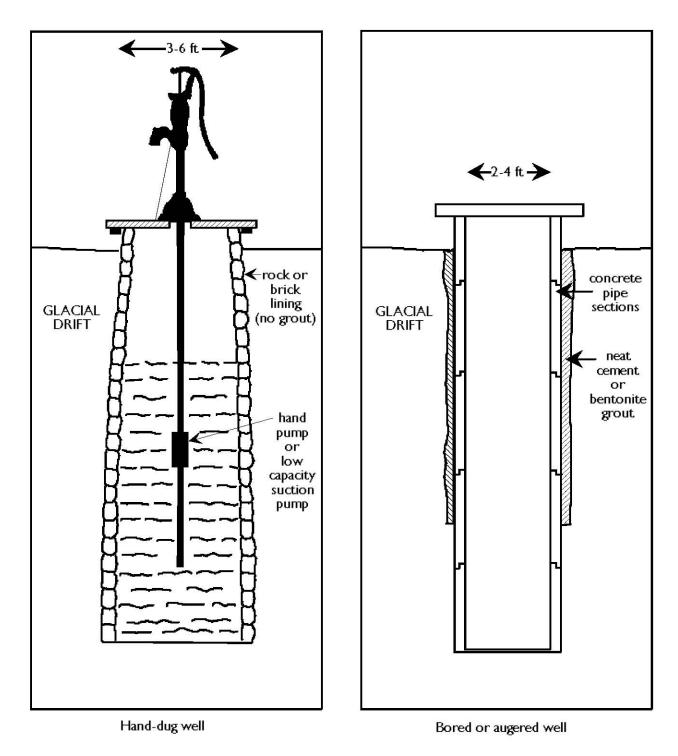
Typical construction used for private hand-dug and augered glacial drift wells.
